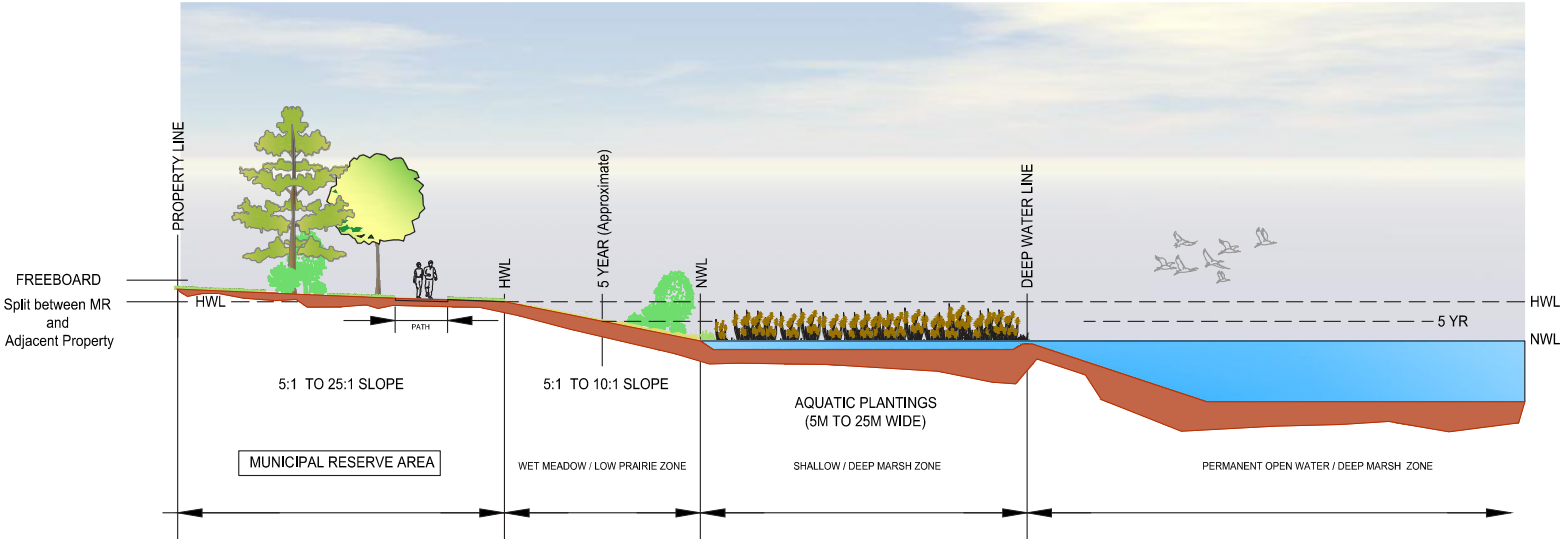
Constructed Wetlands Complex/Stormwater Facility Plan
